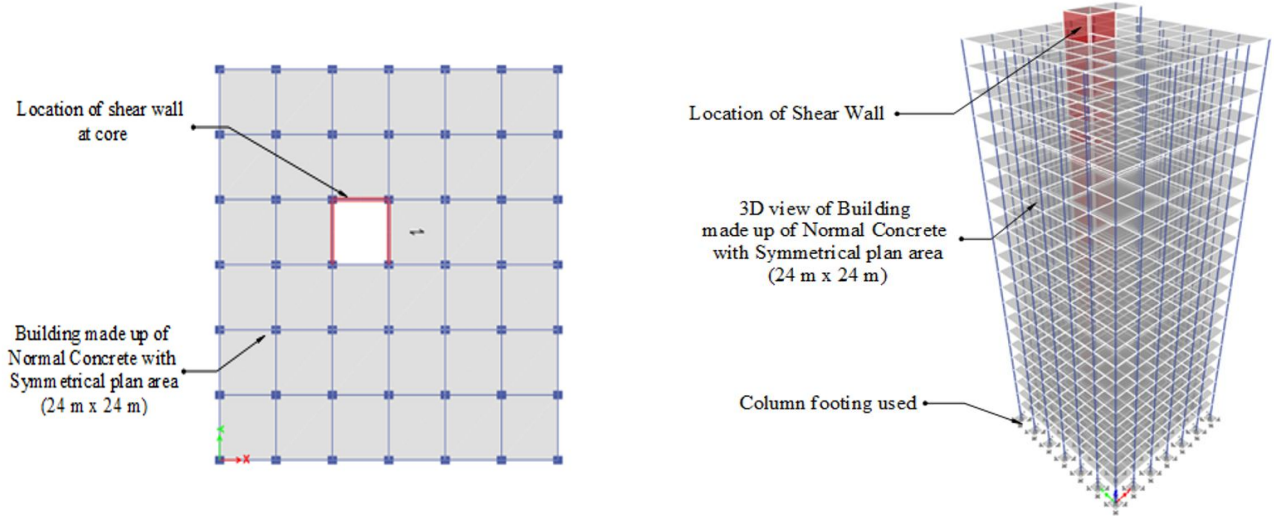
Plan and 3D view of symmetrical plan using Normal Concrete (NC1)
